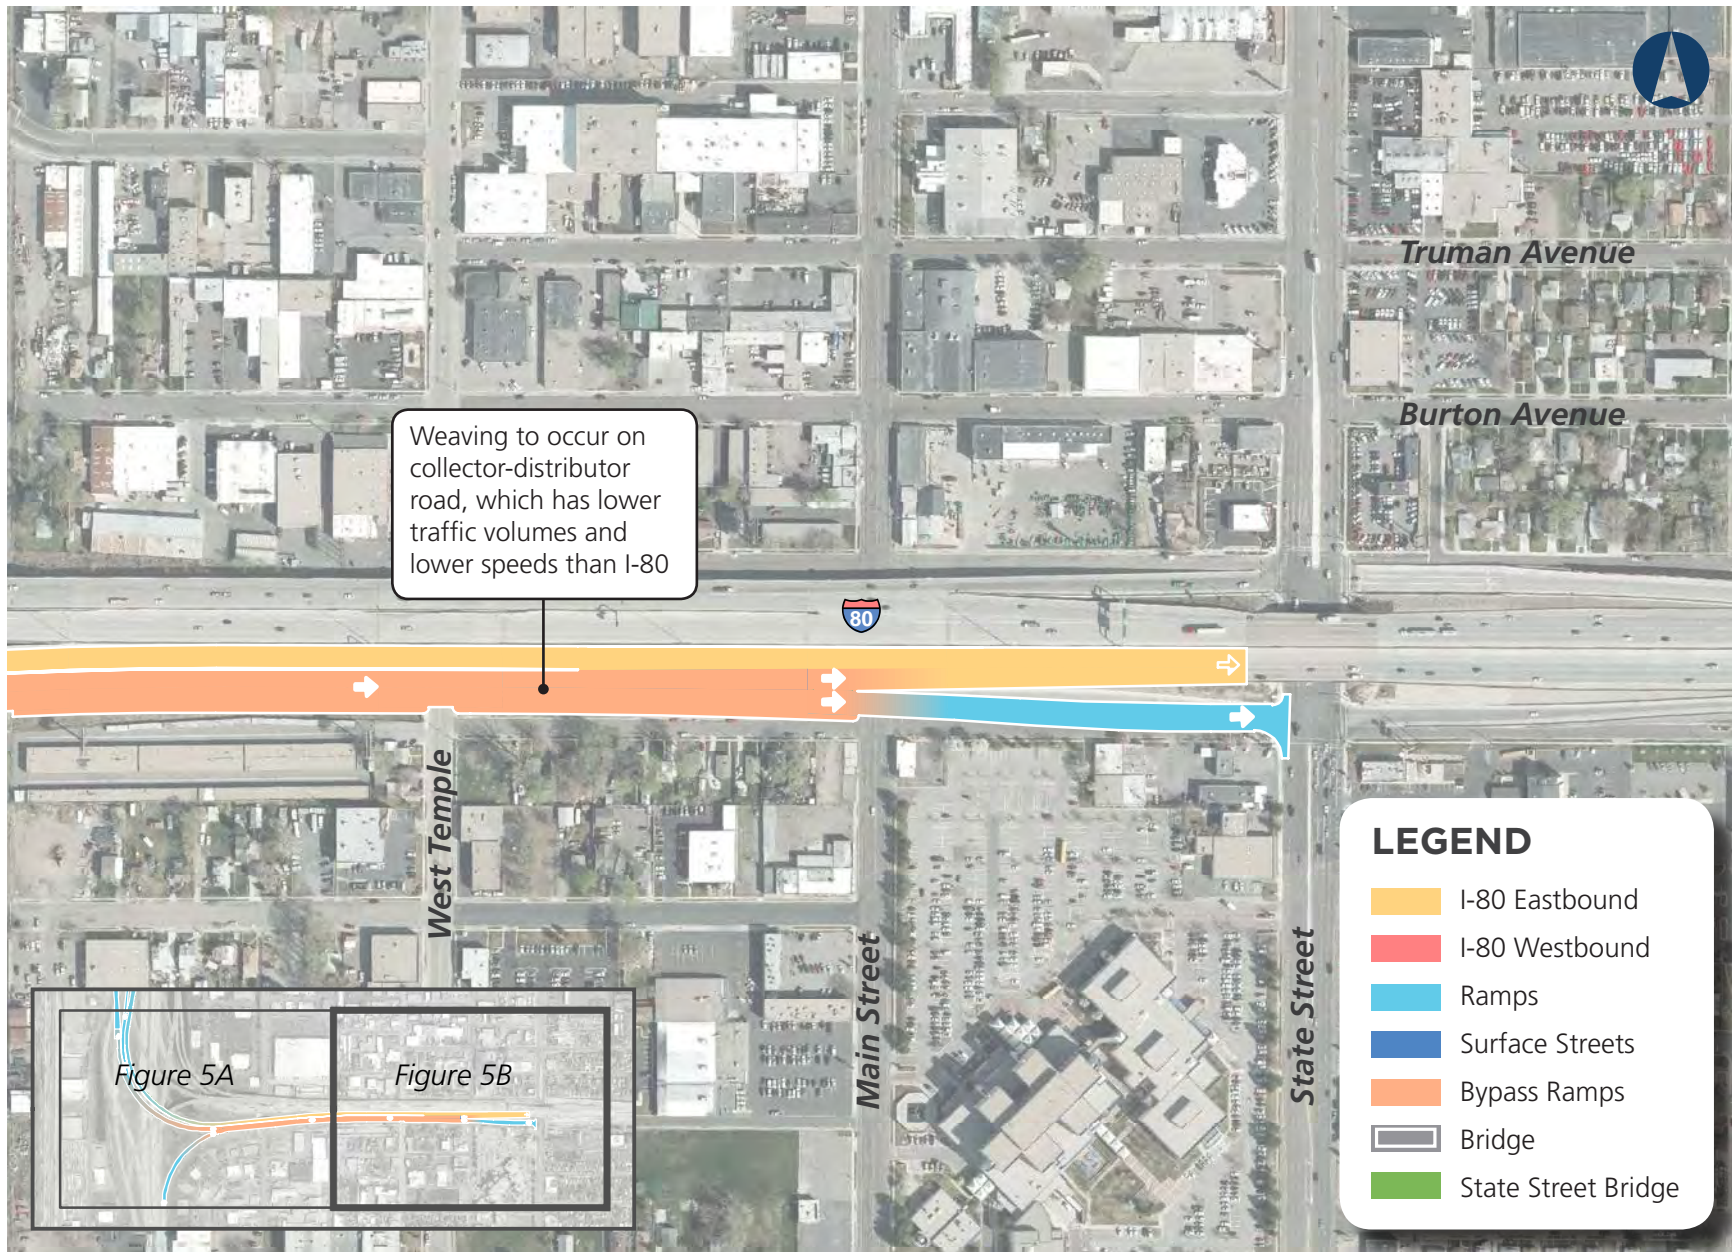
B Eastbound Weave Alternative C – Slip Ramp to Collector-Distributor Road
